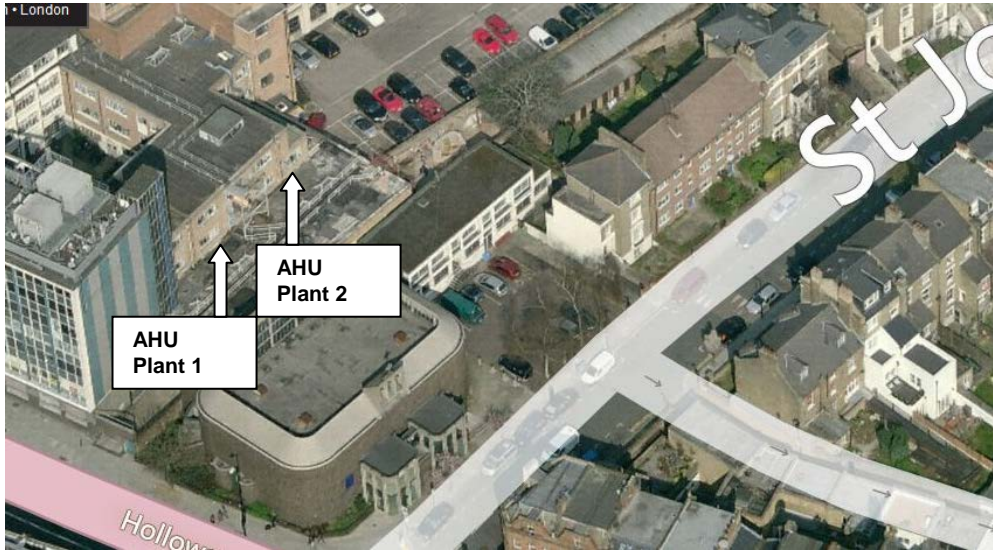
Aerial photography showing proposed position of 2 air-handling units on the roof.
